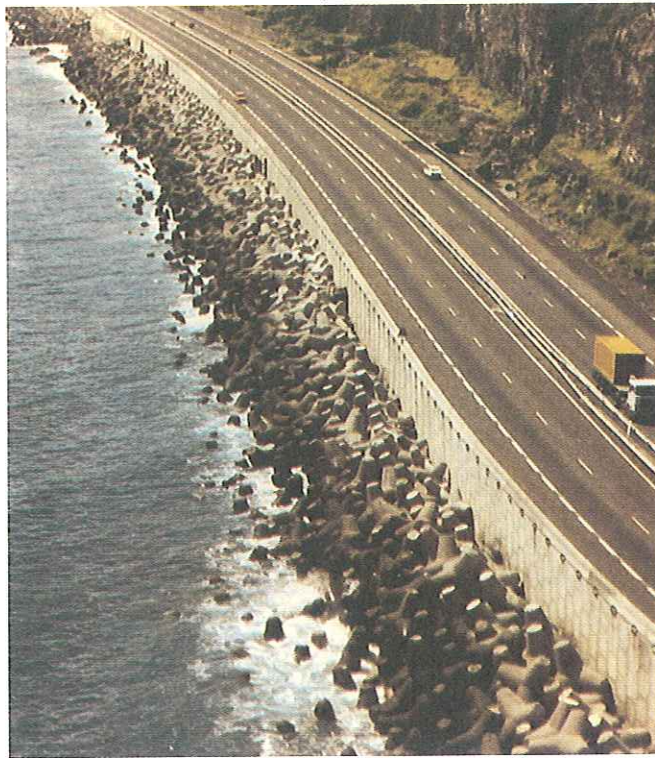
Reinforced earth wall installed to move alignment away from a ravelling rock slope. Many different aesthetically appealing facings are available with this type of construction.
